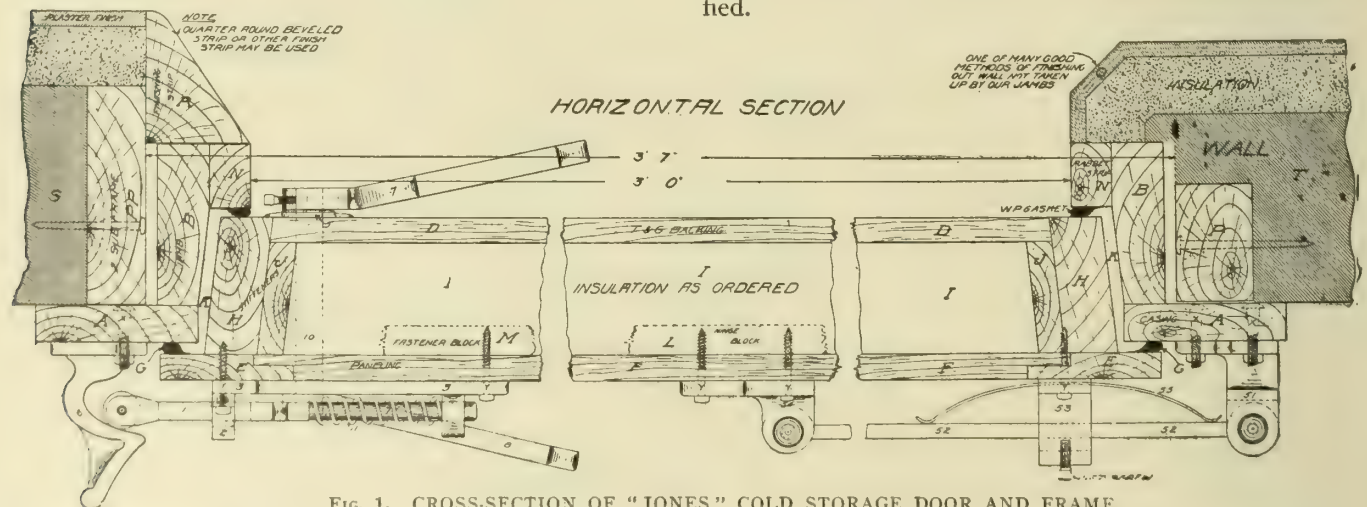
CROSS-SECTION OF "JONES" COLD STORAGE DOOR AND FRAME
